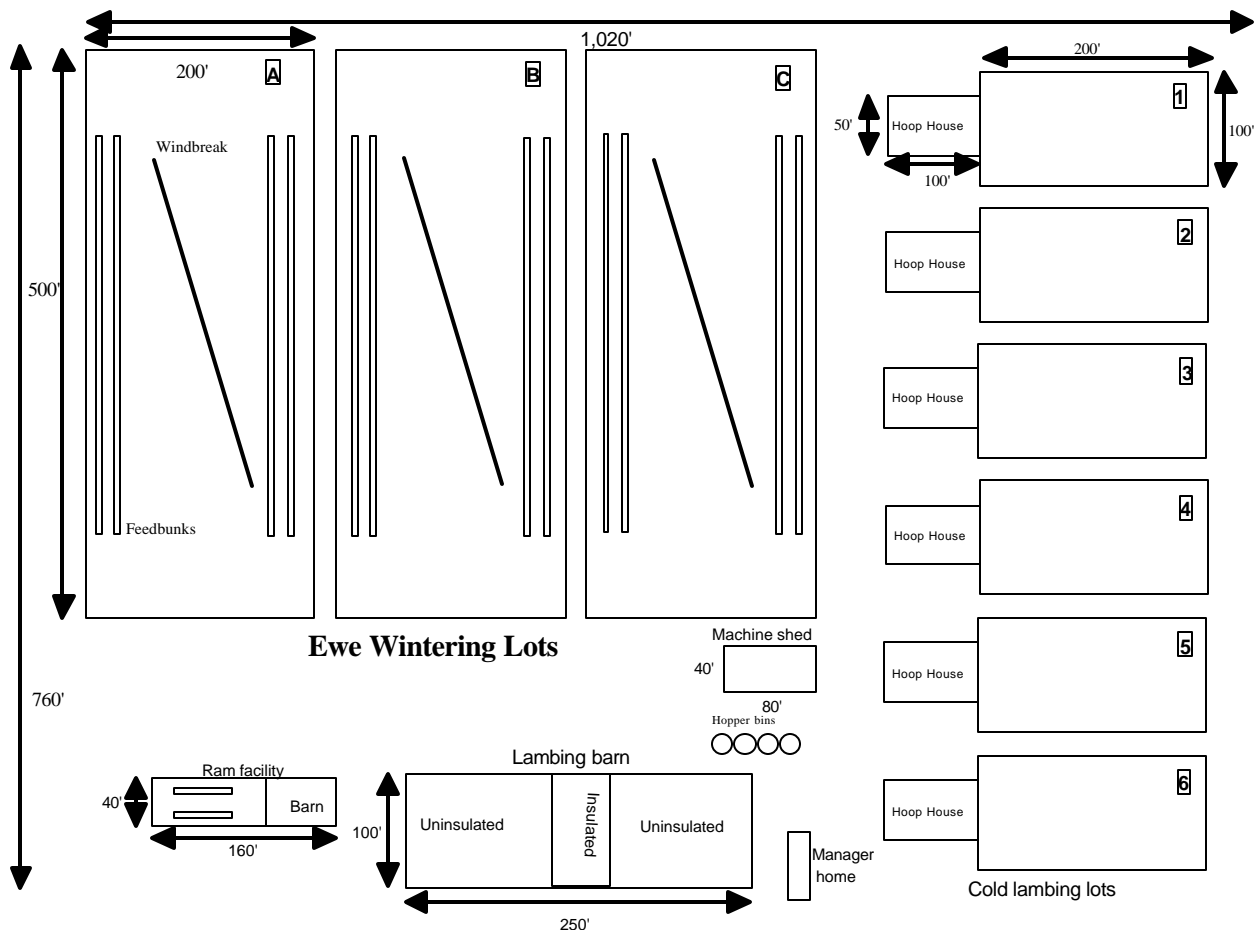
Schematic Drawing of Proposed Winter Lambing Alternative
